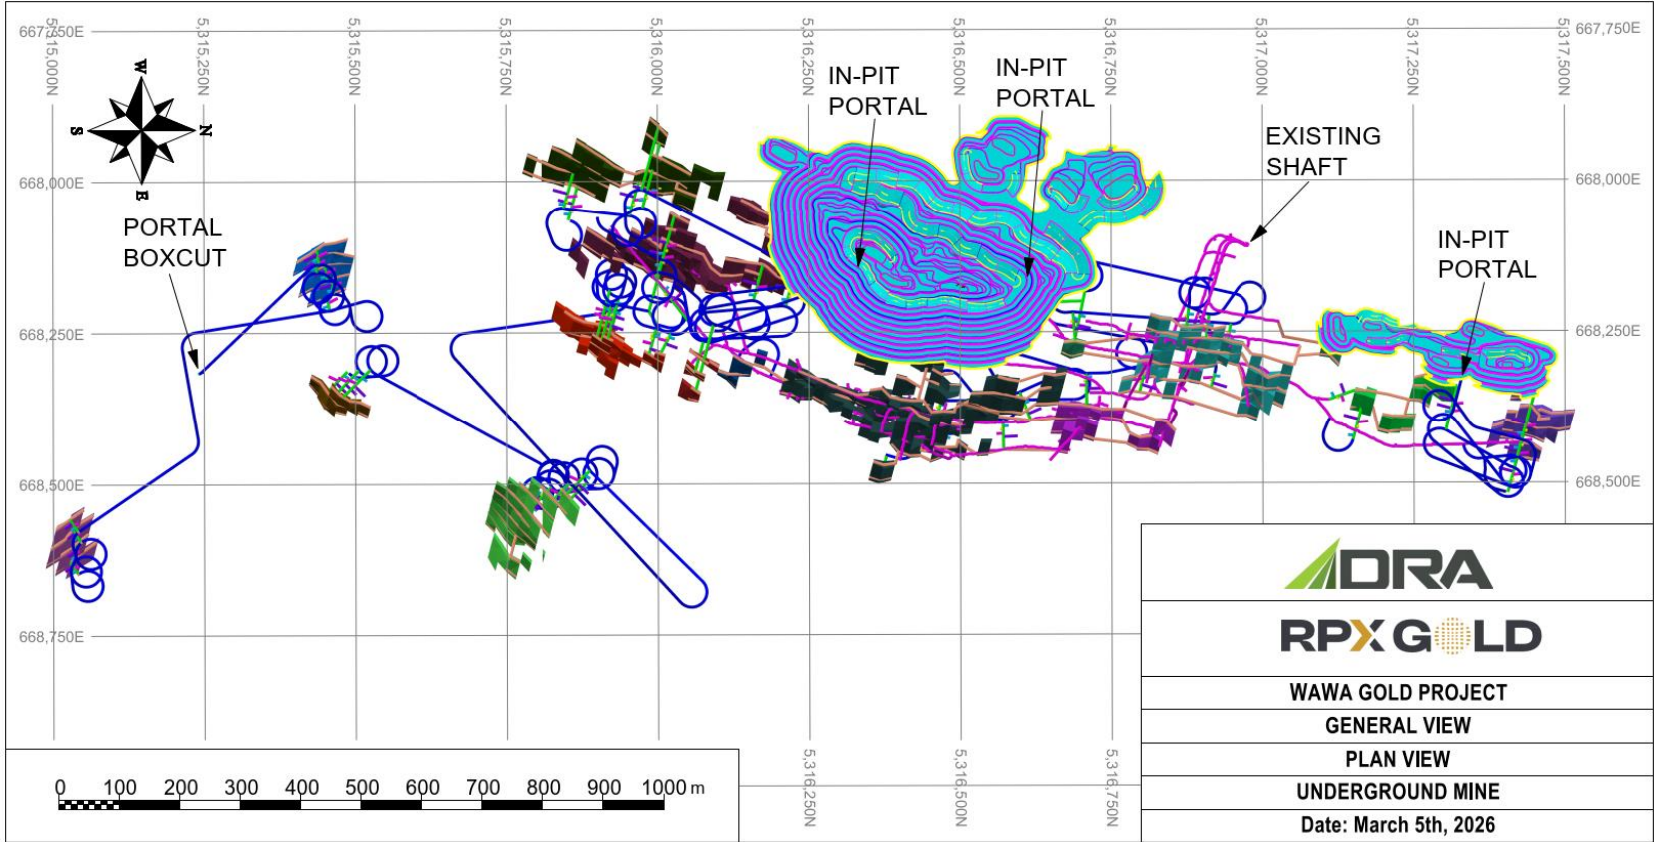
illustrates the general arrangement of underground development and stopes. Figure 16.10 and Figure 16.11 present sectional views of the underground mine layout looking west and looking north, respectively.
